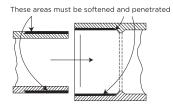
solvent cement coatings of sufficient thickness applied uniformly around pipe and inside fitting socket
